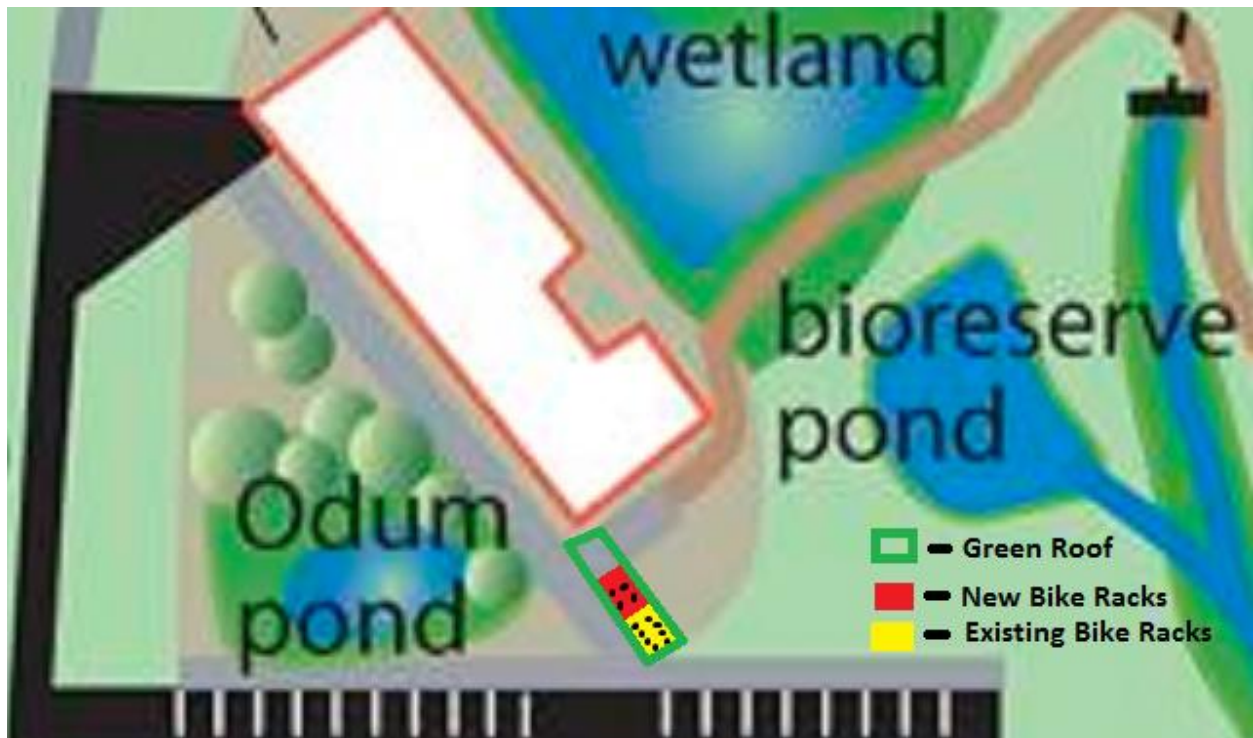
Proposed project building area (Batson, Mander, & Mitsch, 2012). This figure shows where the green roof and new bike racks would be added in relation to the wetlands.
